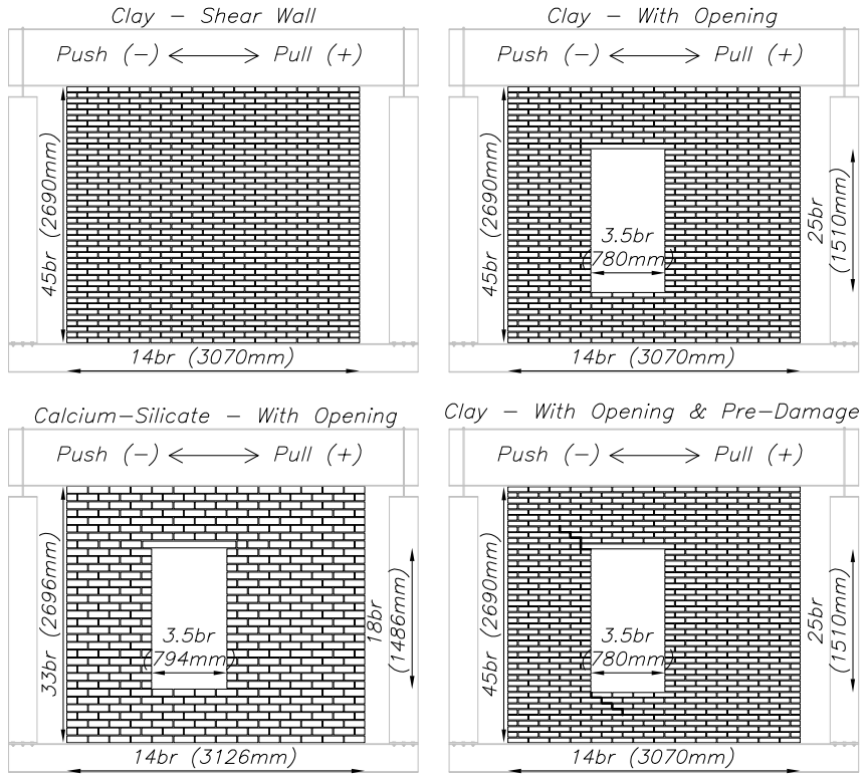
Drawings of the four types of wall specimens tested. Note: 'br' stands for 'bricks'.
